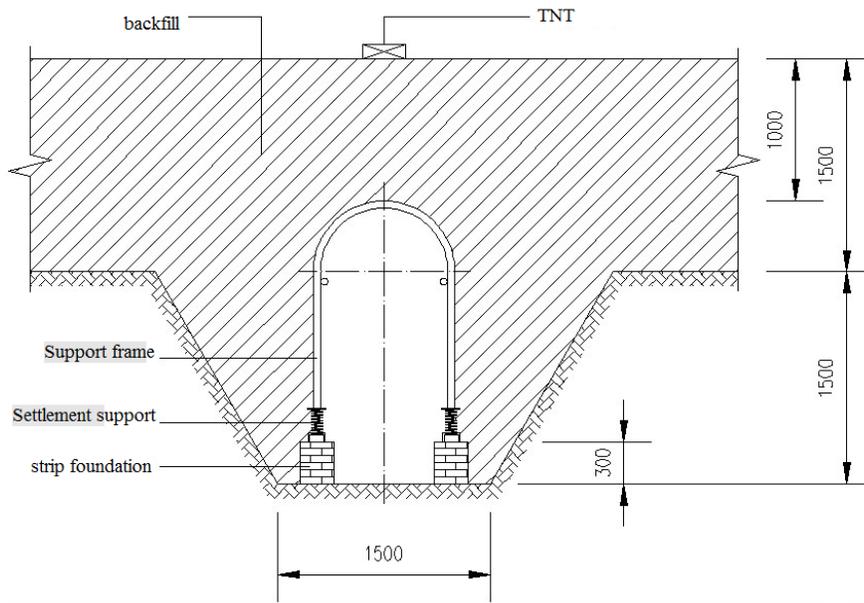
Schematic diagram of the section of test structure and the loading set-up
